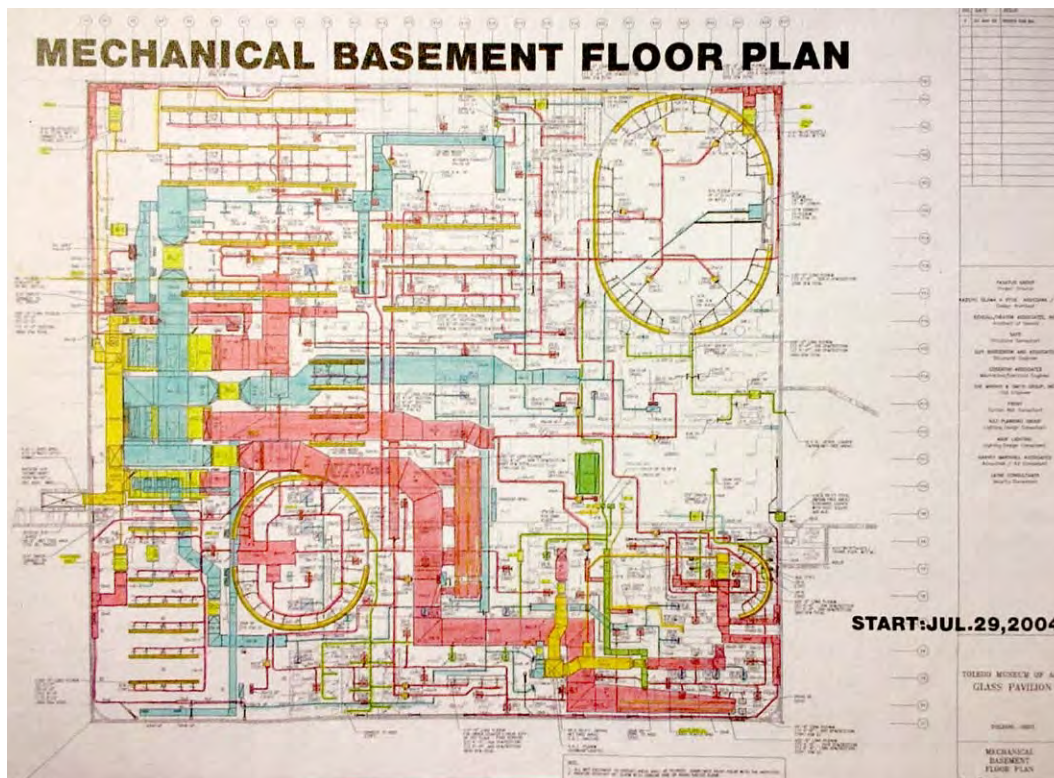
Mechanical basement floor plan. Half of the basement floor is used for glass making facilities. The ducts are positioned on the right side of the plan. On the left where the mechanical rooms are, the major blue, green and yellow ducts are placed. On the bottom right, where the yellow duct is located, there is an open courtyard above, which is a smoking area for the glass blowers. The red shows the air that goes directly through the hot shops and cools the air in the glass shops towards the south façade. The ducts that stop in the middle mark where the audience sits to watch the glass blowing. So the red shows the cooling that happens in the hot shops, which is the hottest space. The blue shows also that air is also being taken in on the left side where there is a big air intake.
